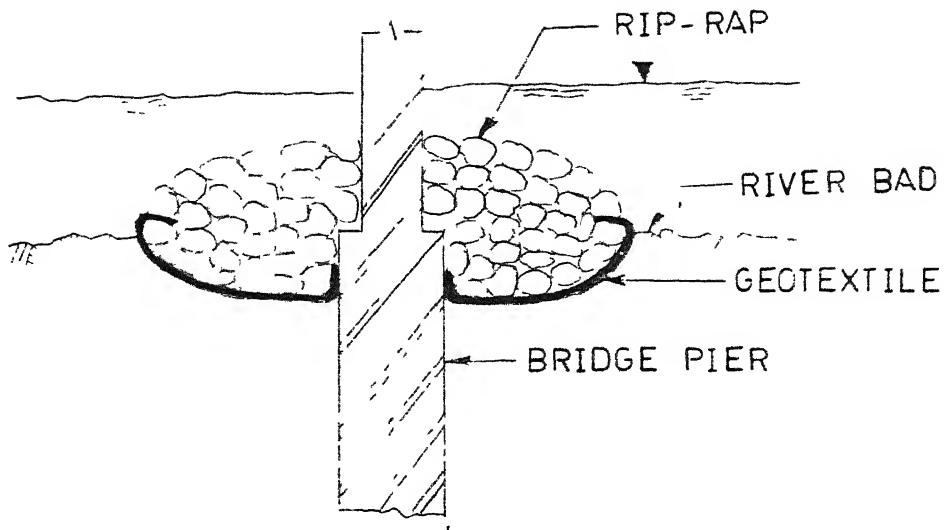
SCOUR PROTECTION FOR BRIDGE PIER
